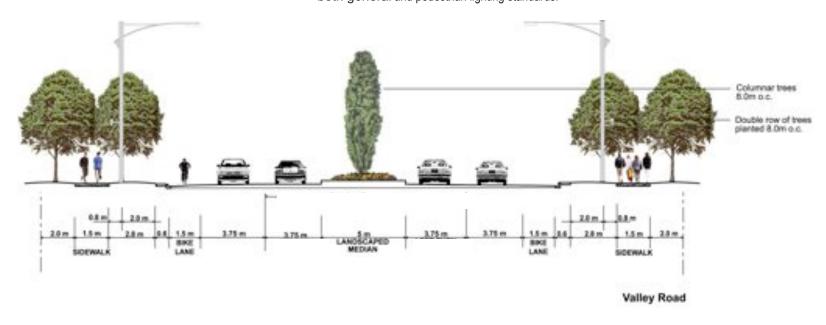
Proposed design of Valley Road illustrating landscaped median and tree-lined sidewalks.
